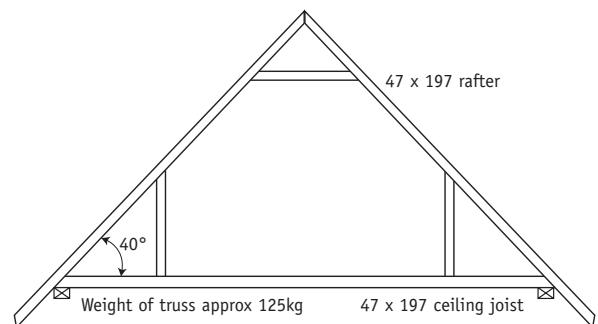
Typical 8 metre span 'Room in Roof' trussed rafter
